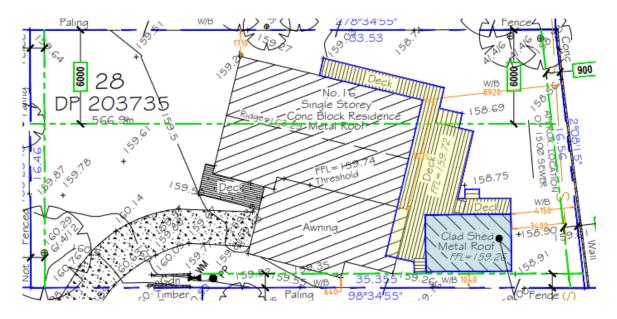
Extract from the attached Architectural Drawings (Site Plan, Sheet 3 of 5 Rev A), showing the location of the deck and shed
